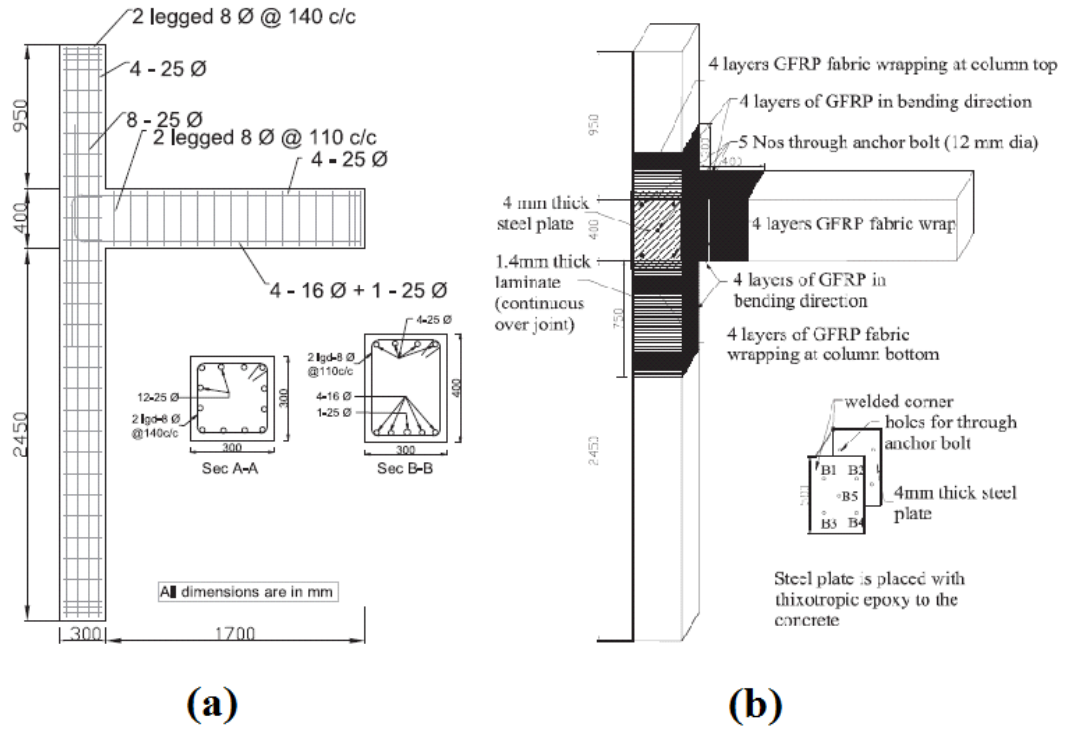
(a) NonDuctile' specimen reinforcement detailing and (b) Retrofitting pattern for damaged 'NonDuctile' specimen [23]
